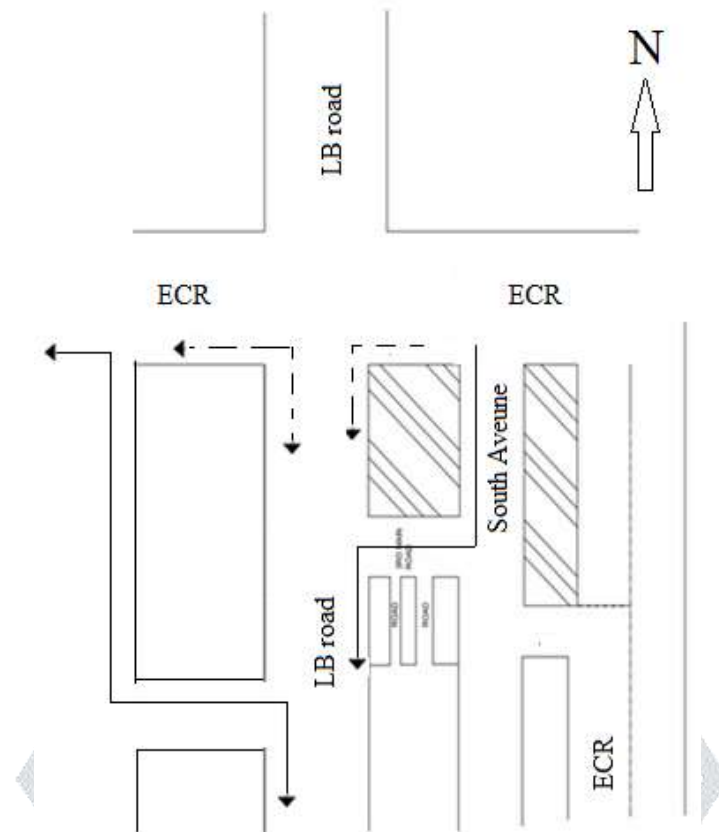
Proposed traffic flow Improvement at LB road South at Thiruvanniyur intersection
